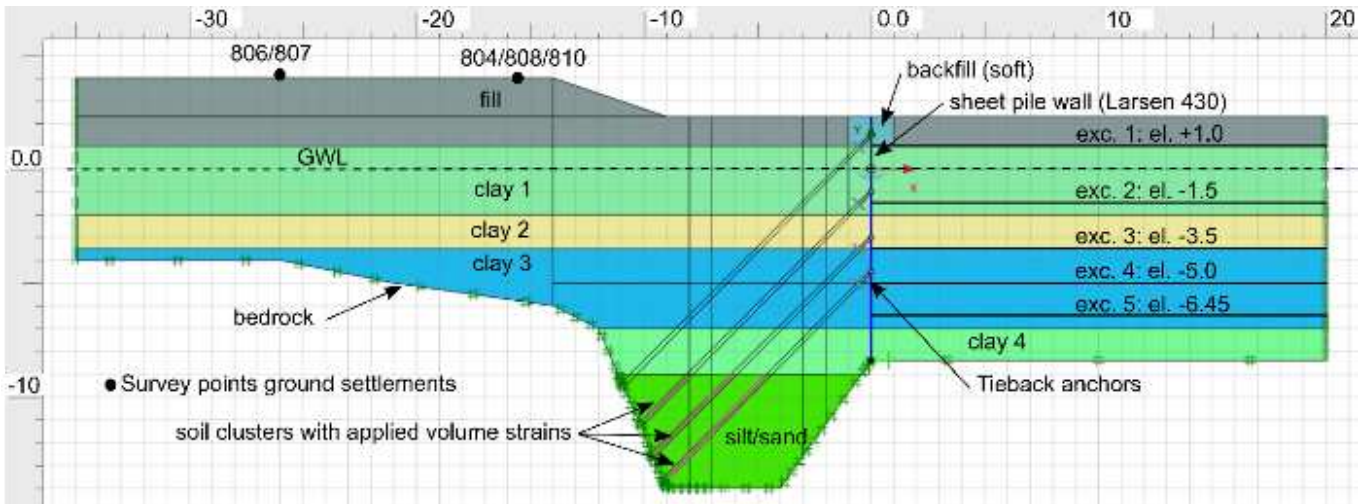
Plaxis 2D model of cross-section B-B showing soil layering, bedrock surface, elevation of the tieback anchors and excavation stages.
